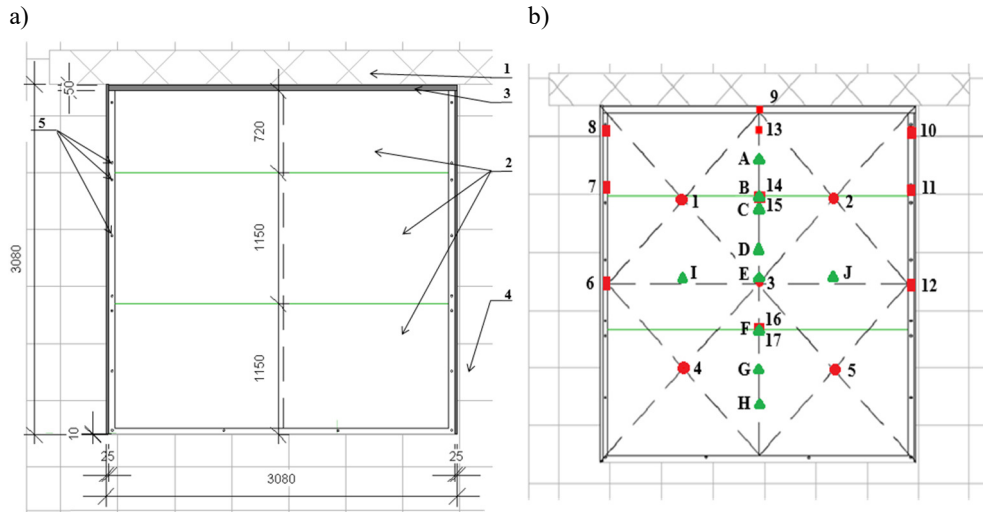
Front view of the assembled sandwich panel wall in Test 1: a) components of the wall: 1 – reinforced concrete lintel, 2 – sandwich panels with a mineral wool core, 3 – free edge filled with insulation material, 4 – aerated concrete blocks, 5 – self-drilling screws with a diameter of 5.5 mm and a length of 190 mm, b) locations of temperature (1-17) and displacement (A-J) measurement points
